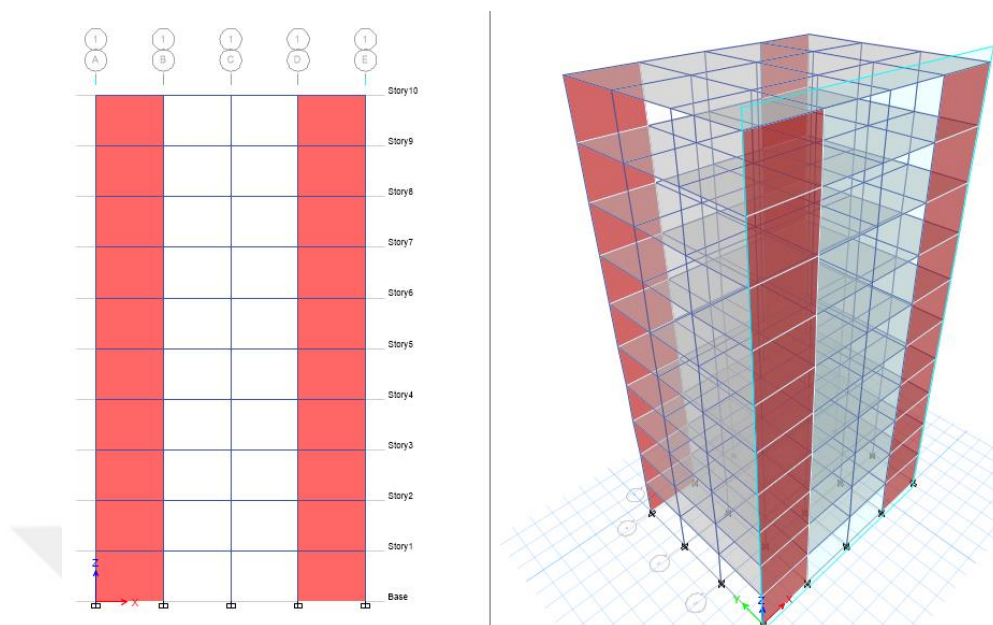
The 10-story building with concrete shear walls and without openings.
